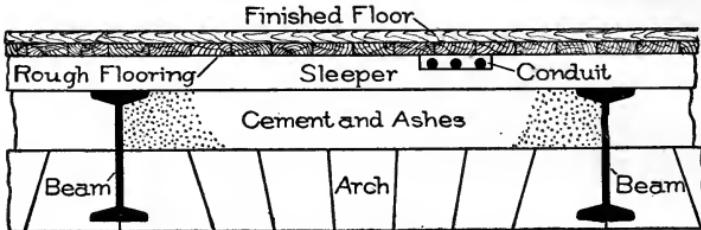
Running Conductors Concealed under Floor in Fireproof Building.
